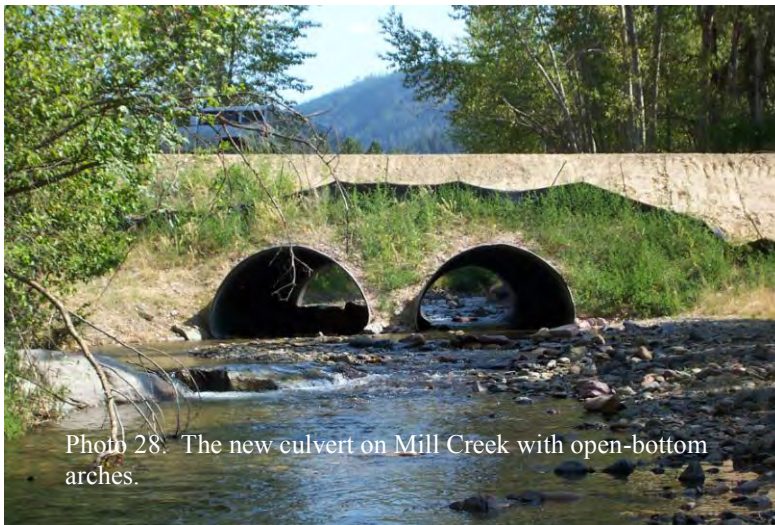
The new culvert on Mill Creek with open-bottom arches.
